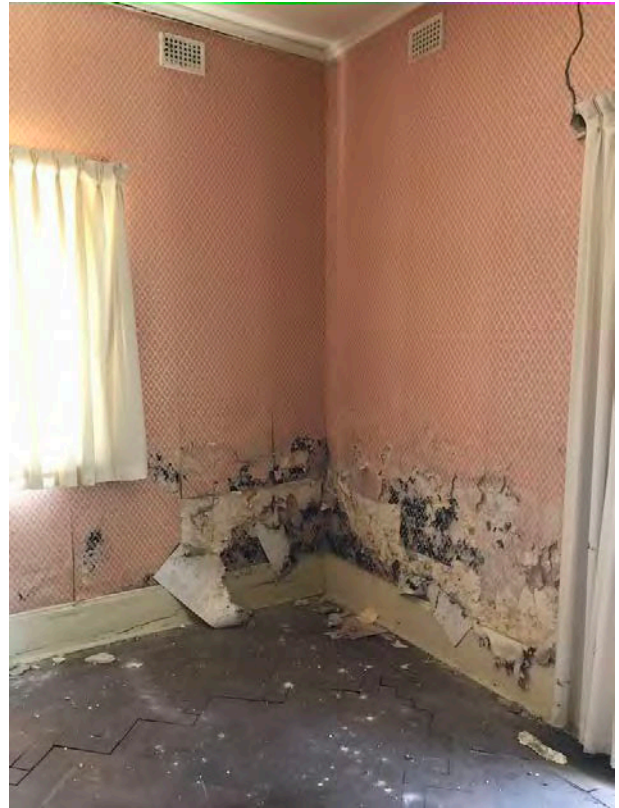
Cracking and damp to masonry walls of double-storey wing. Significant settlement along eastern side of the wing has resulted in major bowing of floor structure
